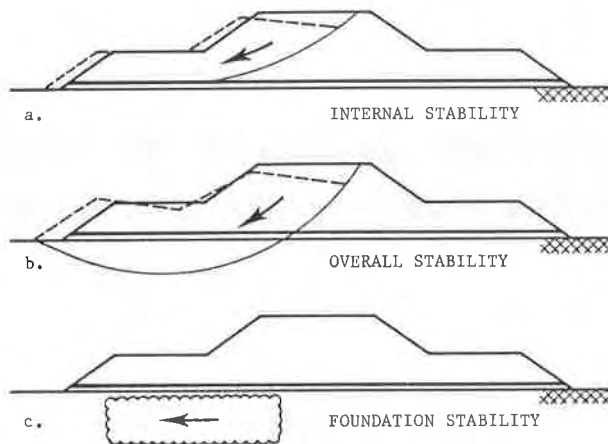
A schematic view of the three principal failure mechanisms for a reinforced embankment on a soft foundation.
